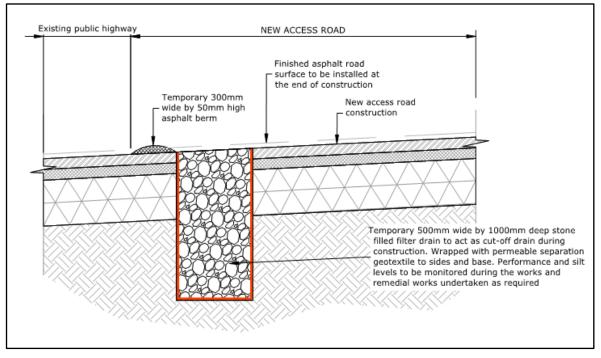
Typical construction detail for temporary filter drain & berm at site entrance
